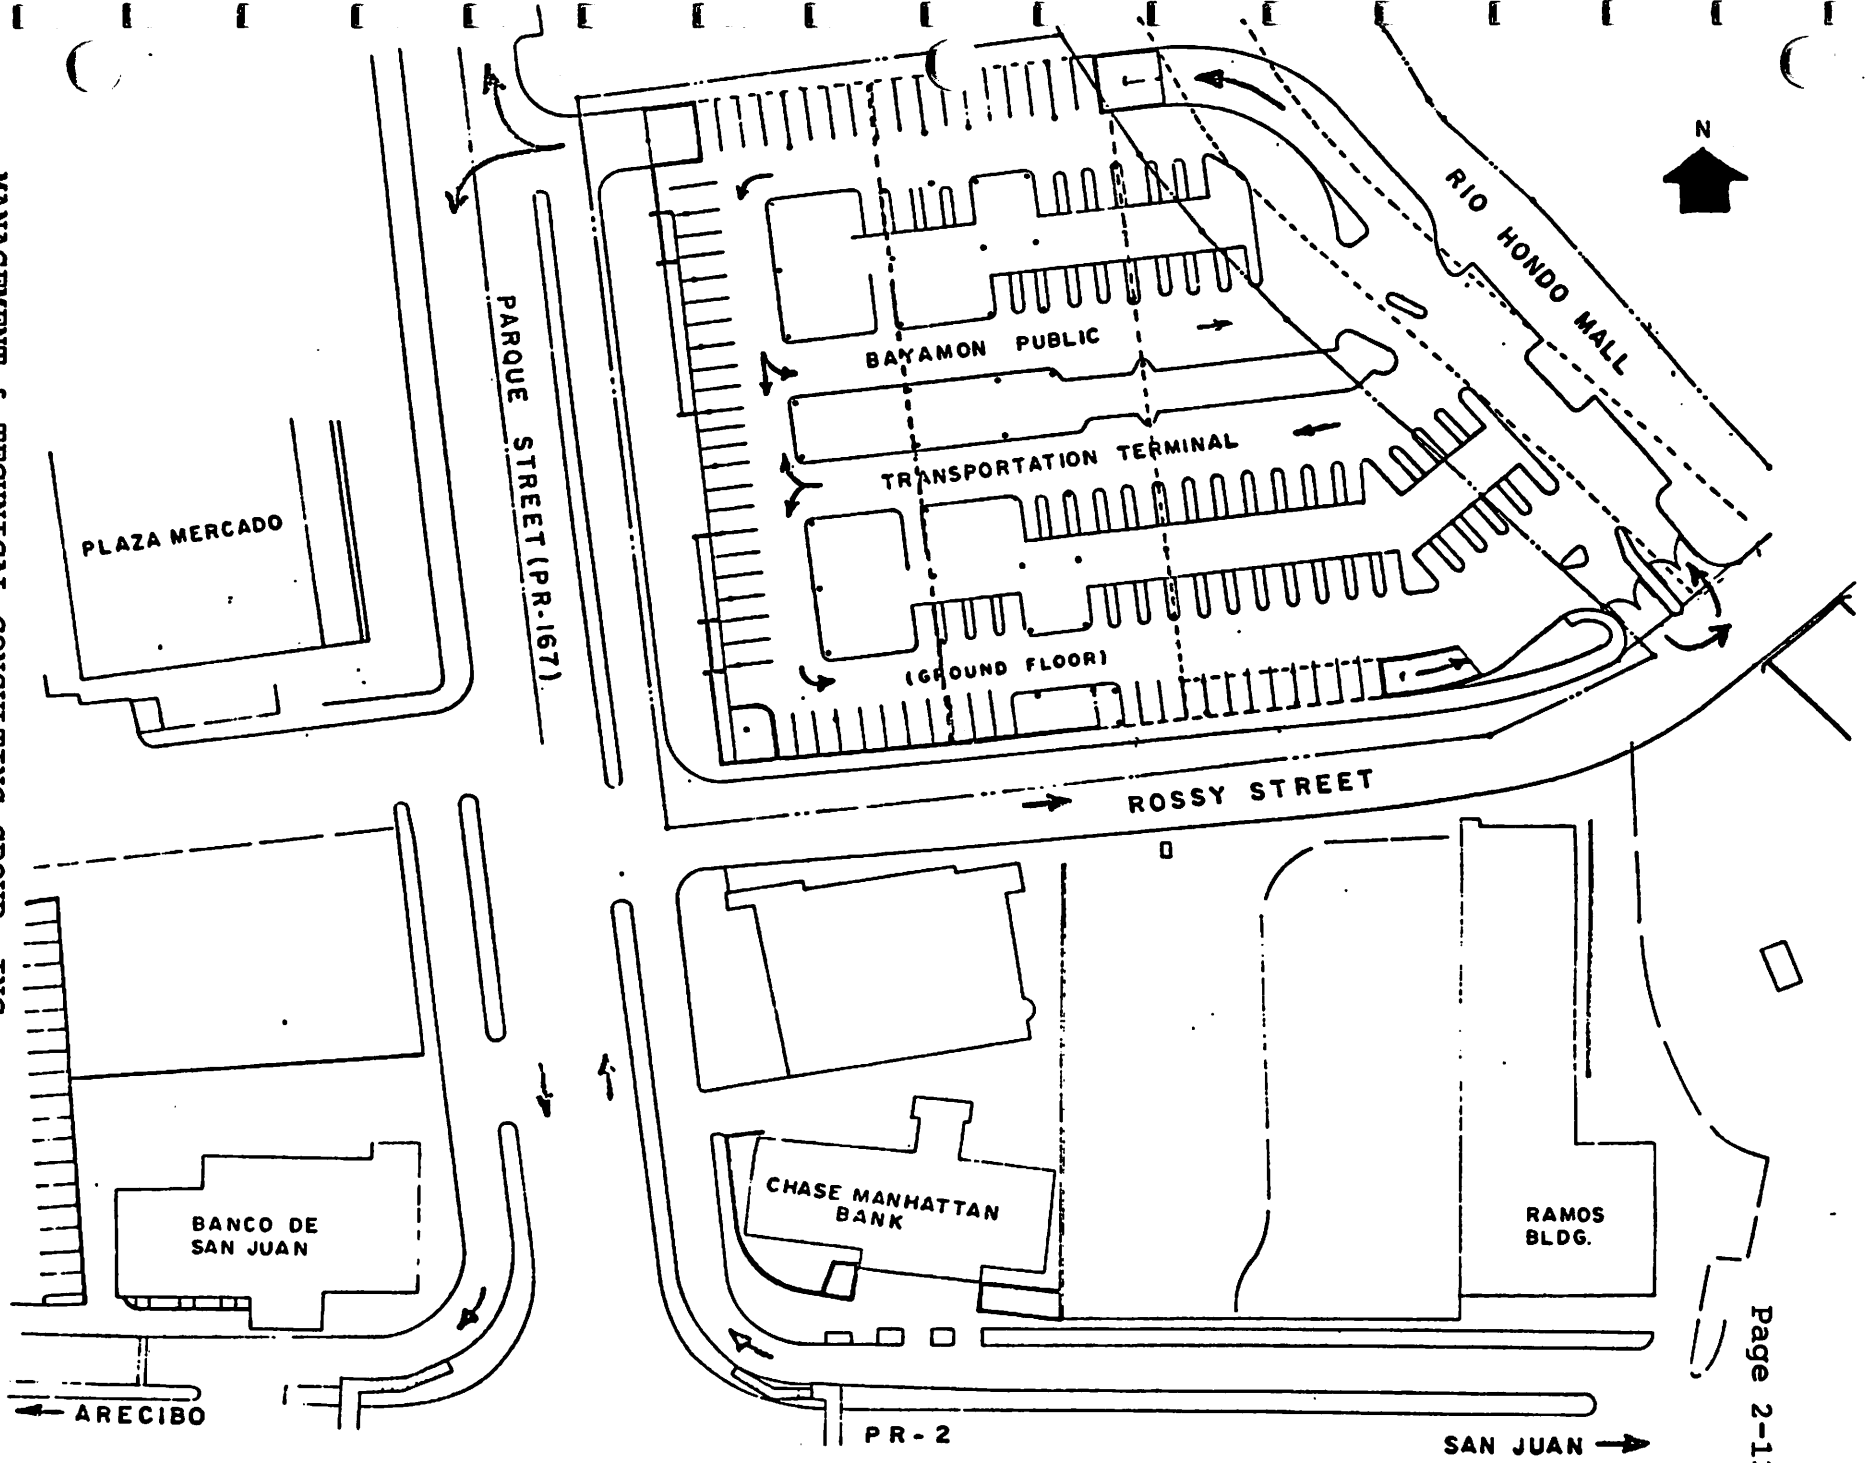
LAYOUT OF KUILAN TERMINAL
